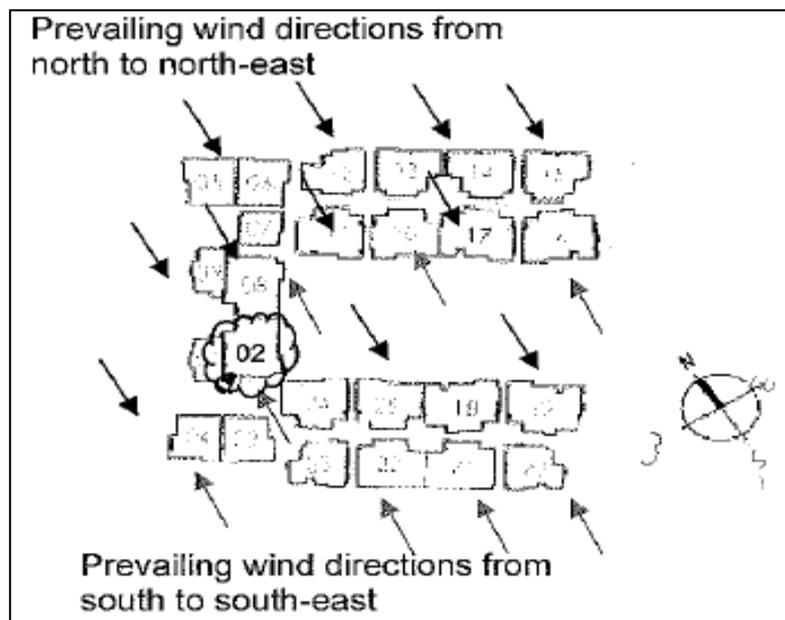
Building layout design that facilitate cross ventilation
